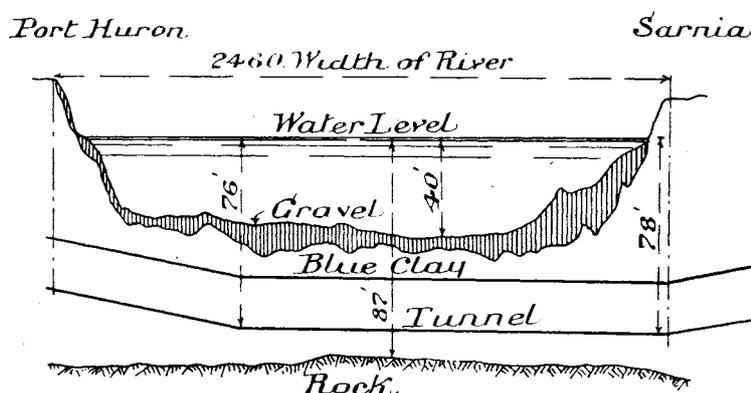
ST. CLAIR TUNNEL, CANADA.
